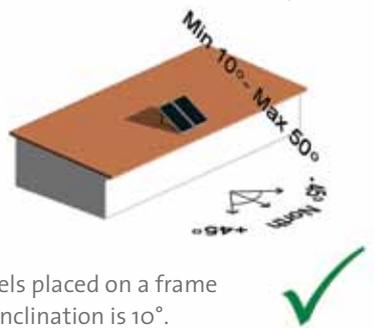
Collector panels placed on a frame so that the minimum inclination is 10°.
